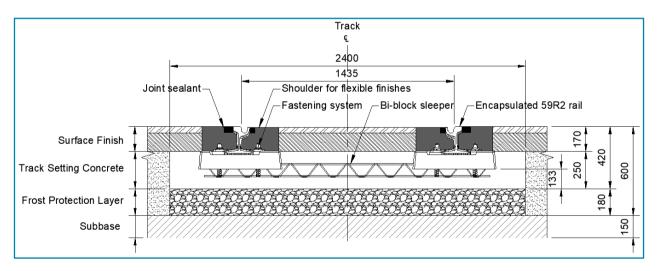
Embedded Track (Source: Barry-Egis JV)
